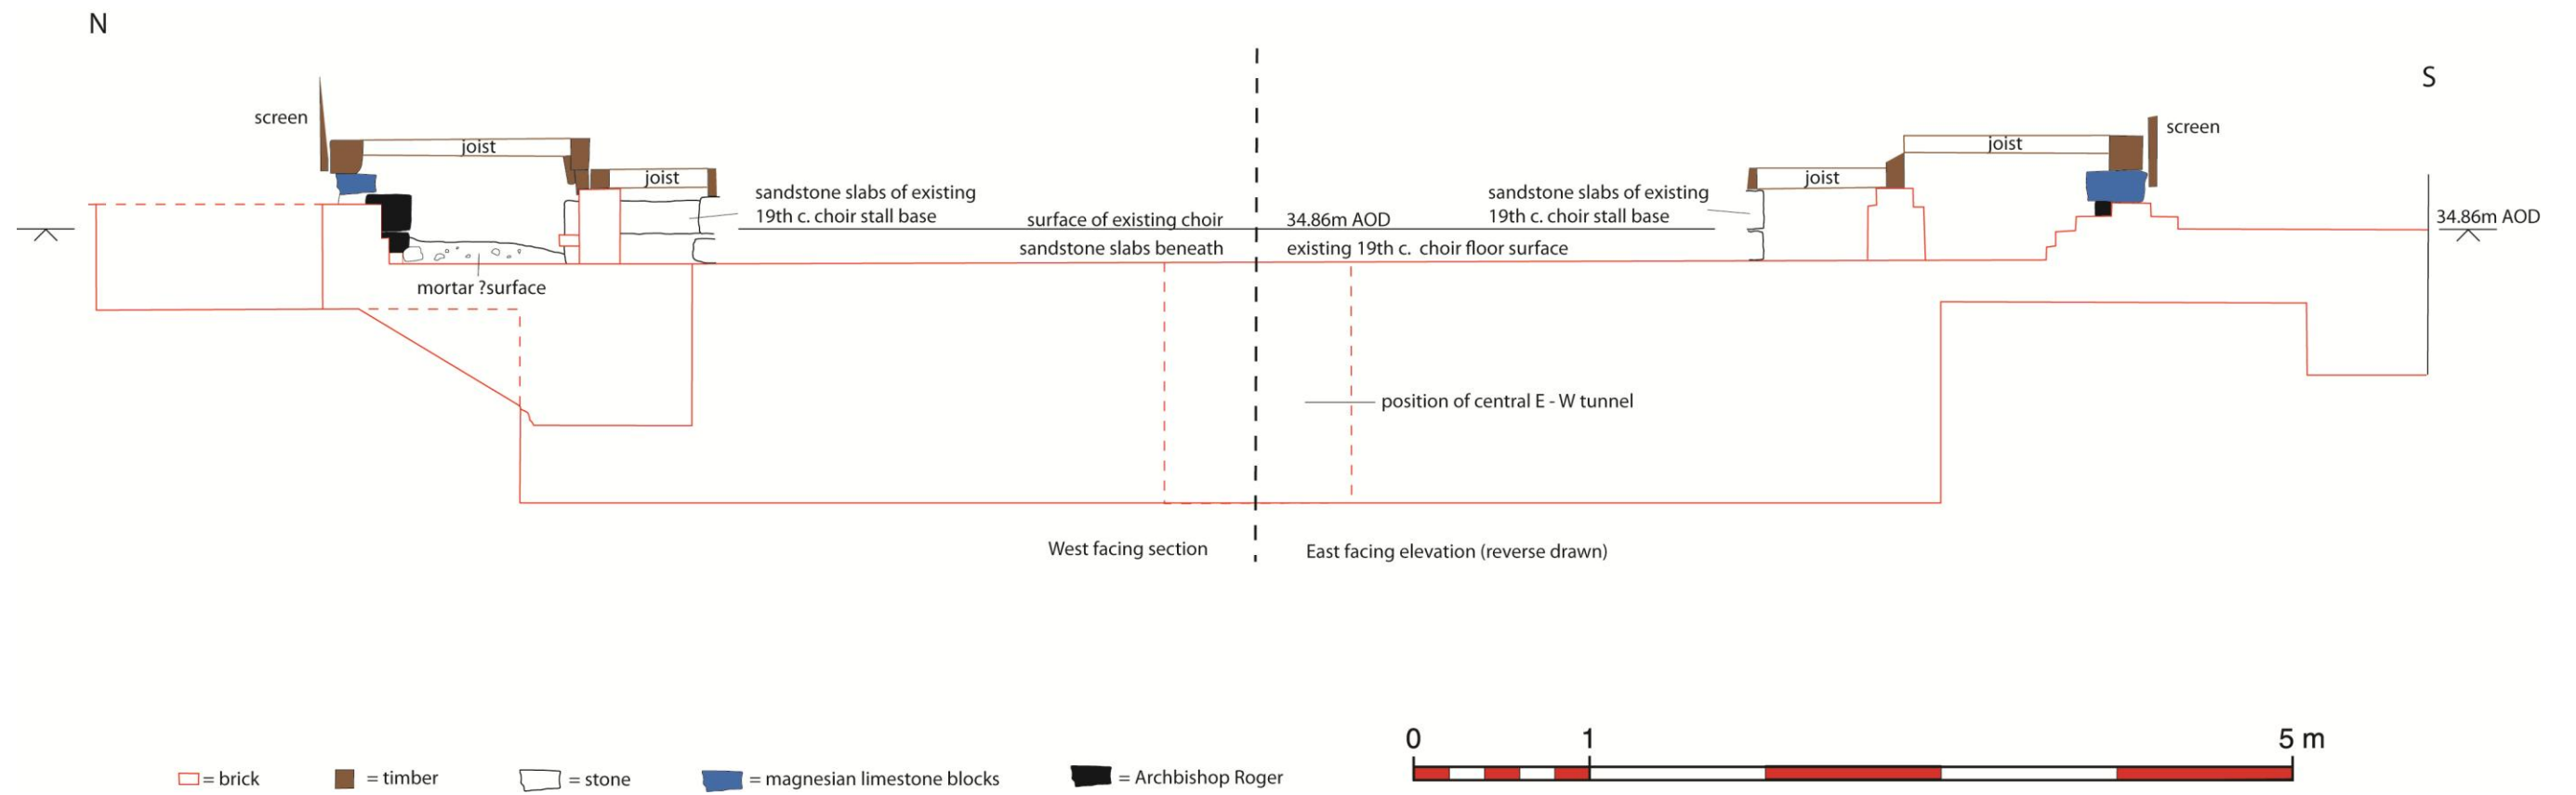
N-S elevation along arm of 'T' shaped arrangement of organ ducts
